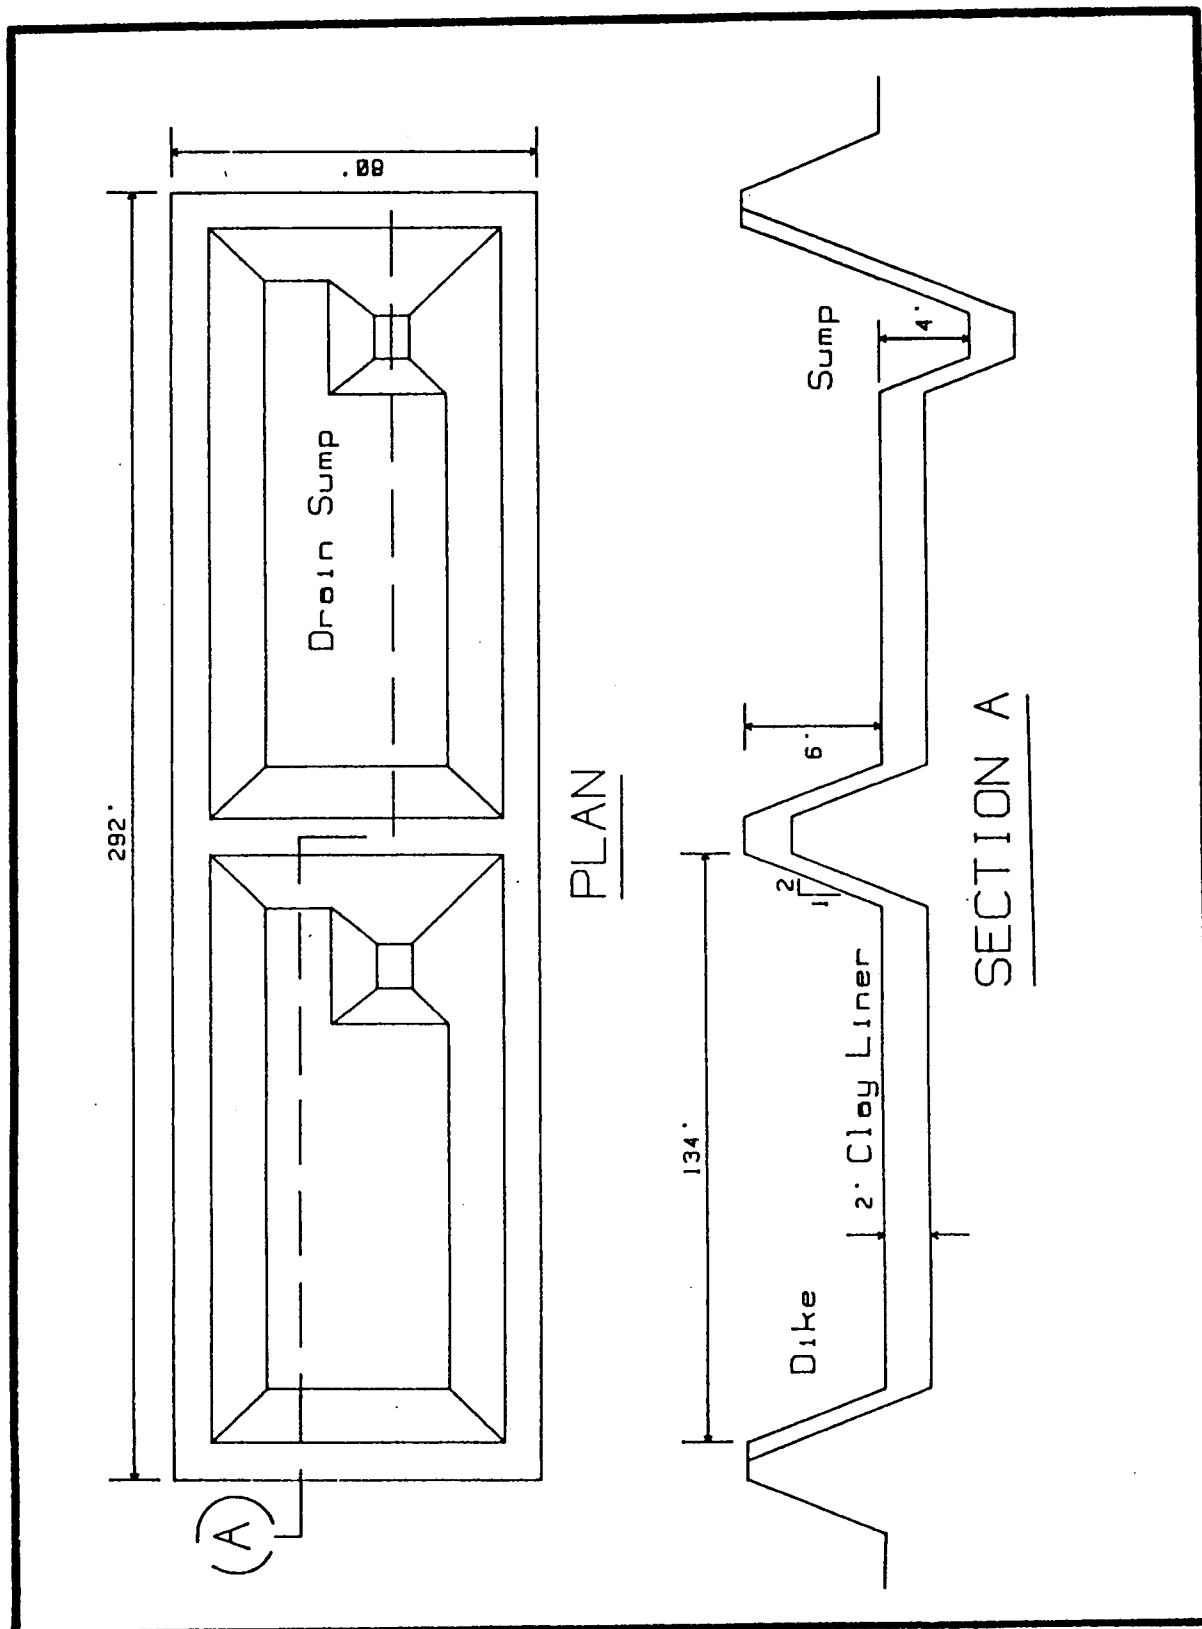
Drawing of Oxidation/Percolation Ponds at Mars Site (Typical)
